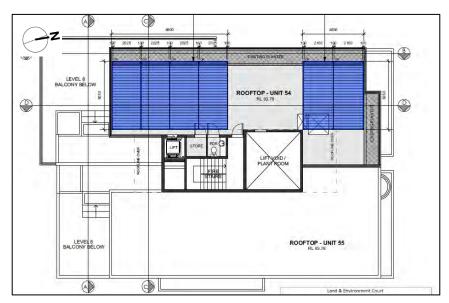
Extract of approved roof plan at Unit 54 of the RFB.
